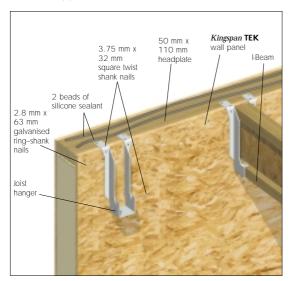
LOCATING AND FIXING JOIST HANGERS FOR FIRST FLOOR DECK
